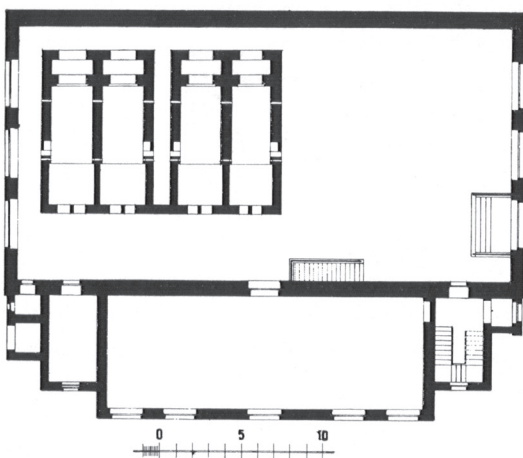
The first floor plan of the Boiler House. [12, p. 35]
